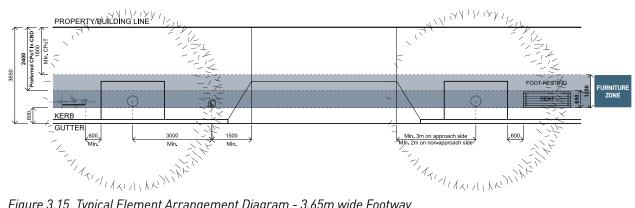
Typical Element Arrangement Diagram - 3.65m wide Footway
